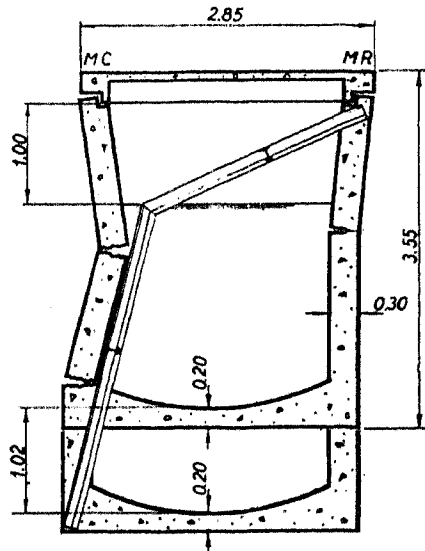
Tunnel 1. Maipo Canal - Typical section.
